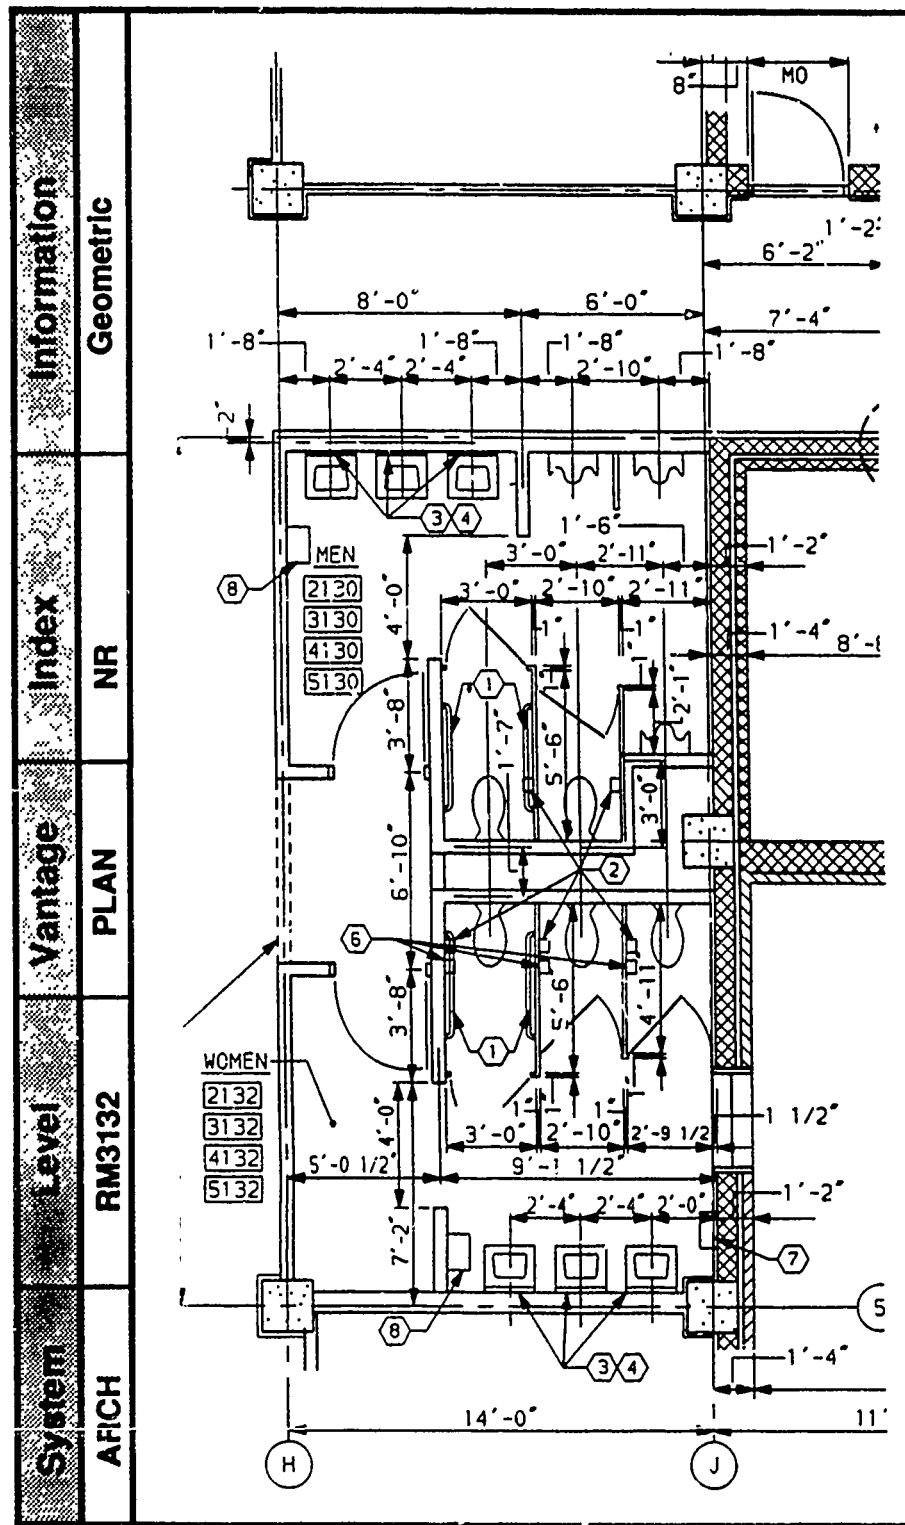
Example of Frame for Case 13: Room 3132 Architectural Plan
